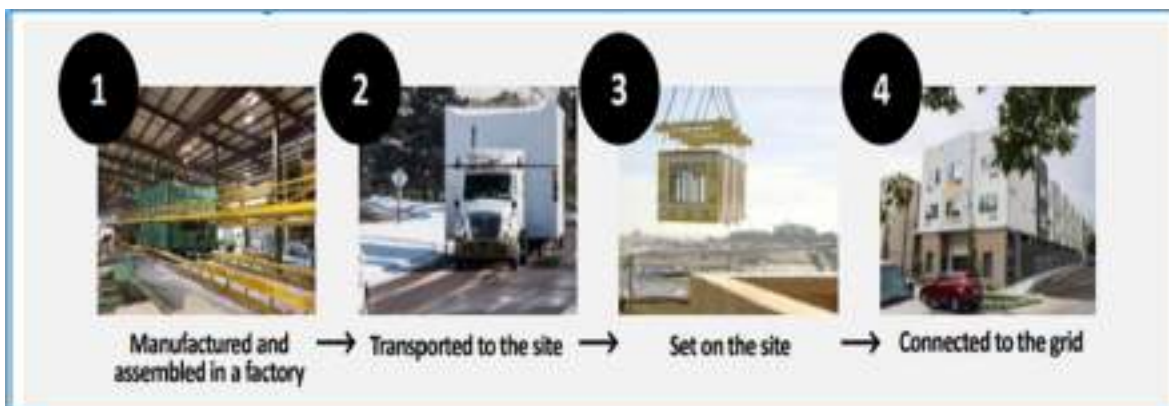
Four Stages of Industrialized Construction of Modular Buildings [8]
